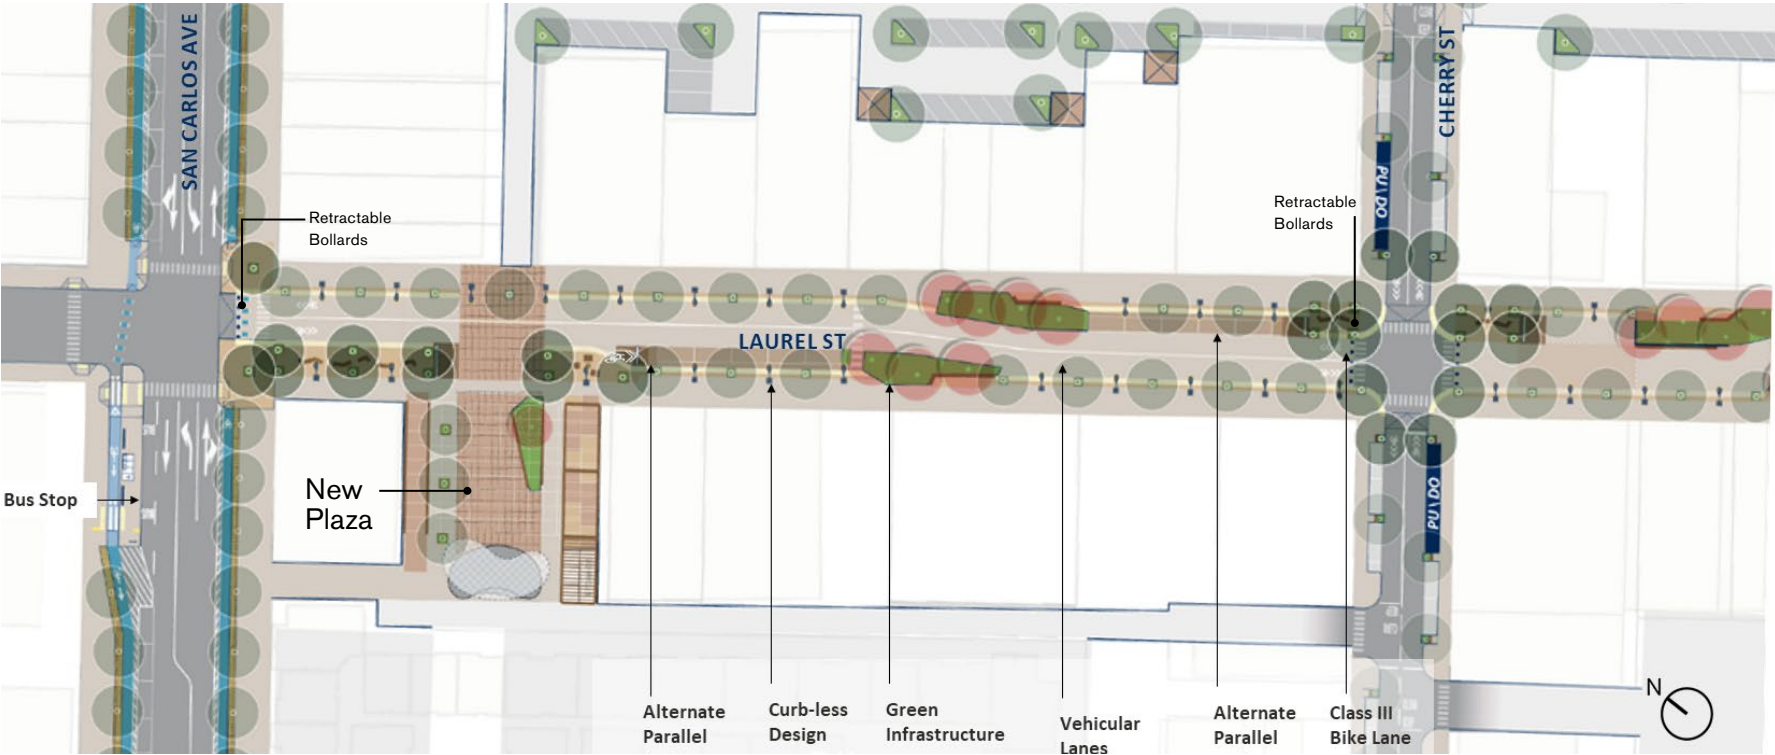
600 BLOCK OF LAUREL STREET ILLUSTRATIVE PLAN
